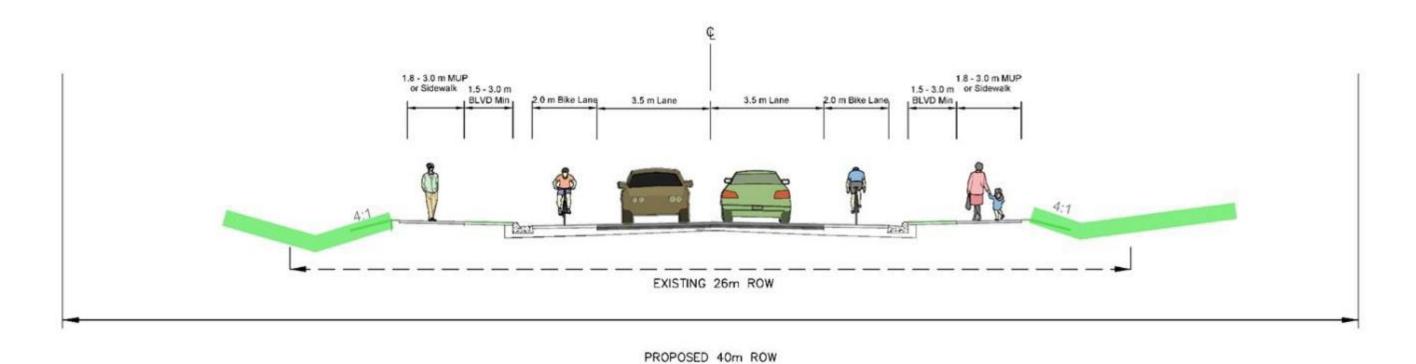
Section 2 Alternative 2 – 2-Lane Urban Cross Section
